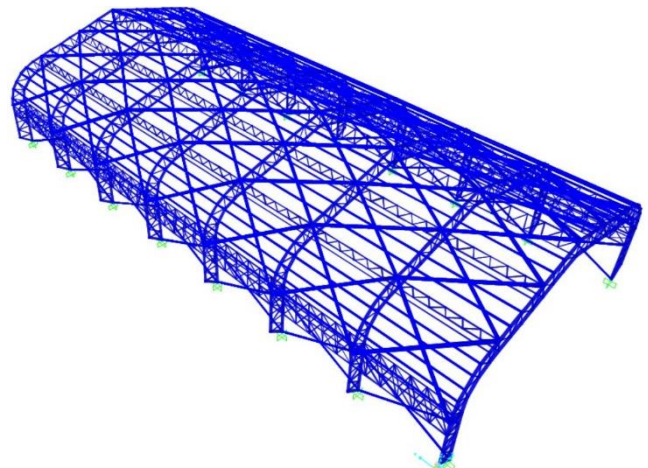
3D view of real-size steel truss structure modeled in SAP2000.
